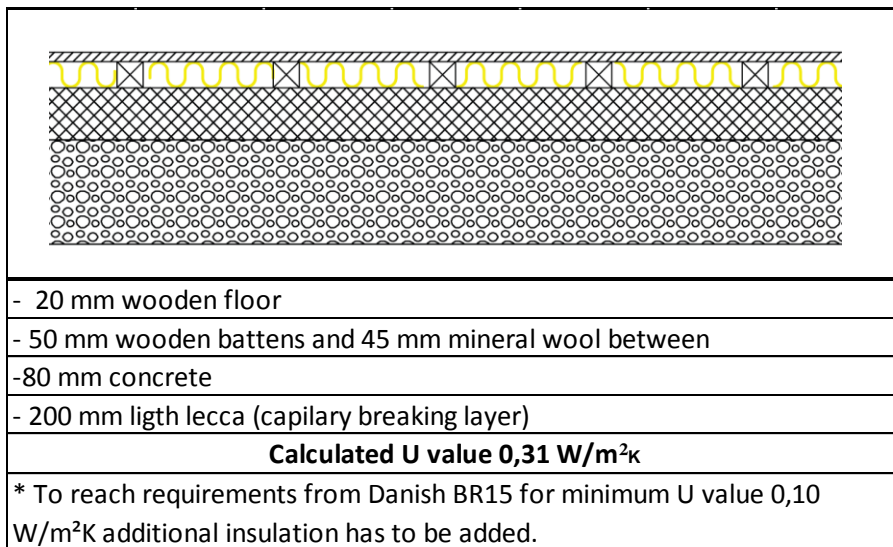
Floor with insulation between wooden battens in 1960-1976.
